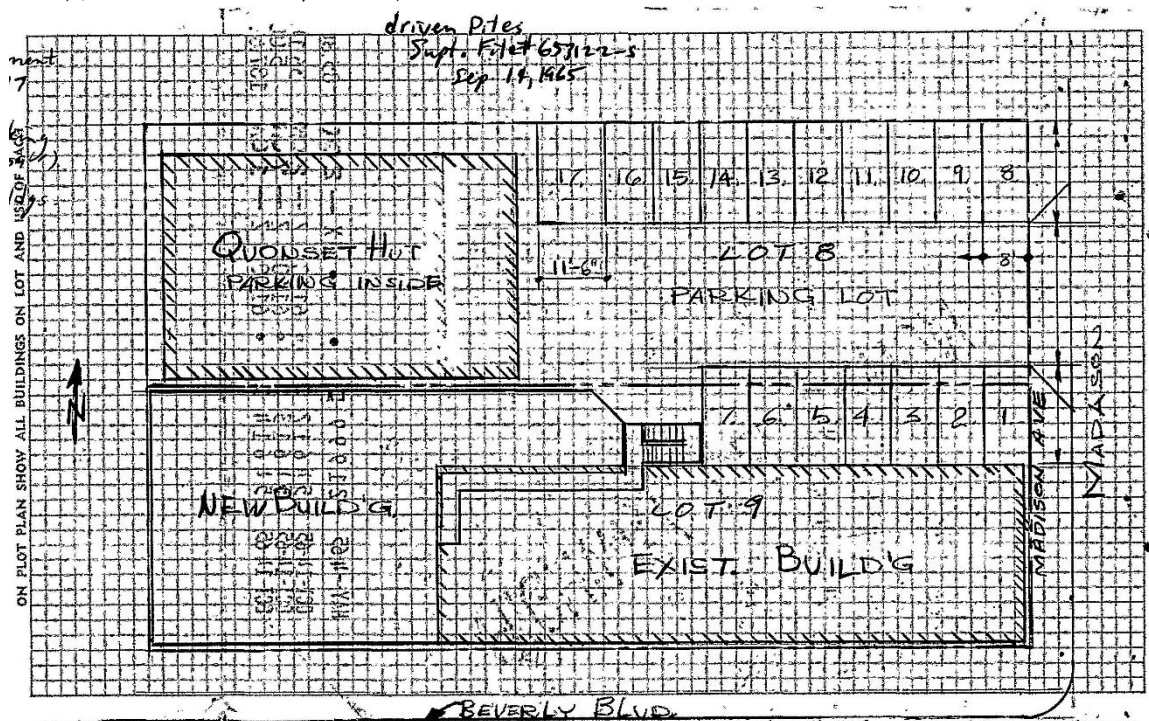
1965 Permit showing new addition to existing building and Quonset hut (Permit 1965LA06160)
